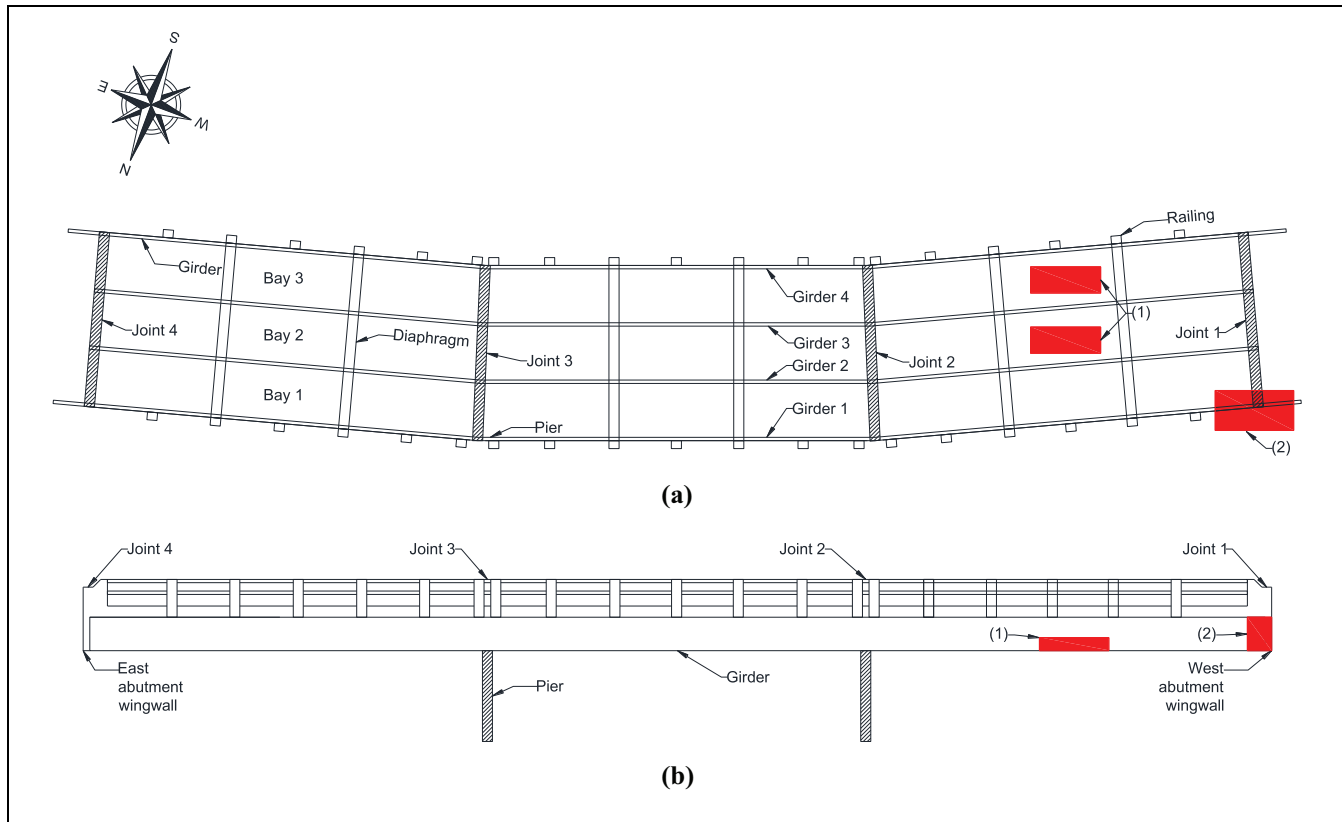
Sketch of three-span timber girder bridge with marked visible defect: (a) plan view and (b) elevation view.
